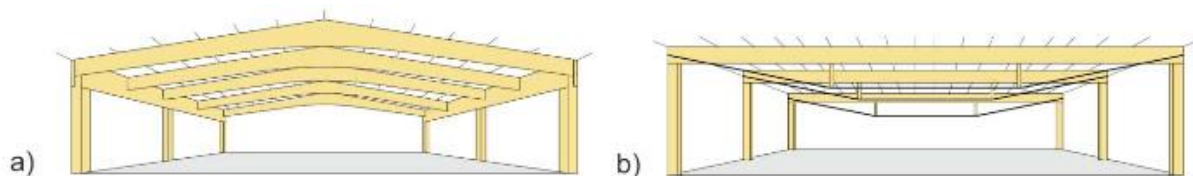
Beam-column systems, a) Boomerang beam, b) Straight beam (Bell et al., 2015)
